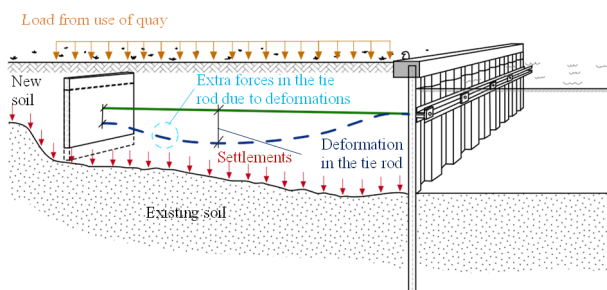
Insufficient knowledge of forces (light blue) makes the horizontal anchors (green) supporting the sheet pile wall (right) break. To the left the anchor plate is seen including its possible settlement. The forces are assumed to come from settlements (red) and overlying loads (orange) causing deformations in the tie rod (dark blue). The sketched deformation of the tie rod is only one of the possible scenarios and is not yet confirmed.
